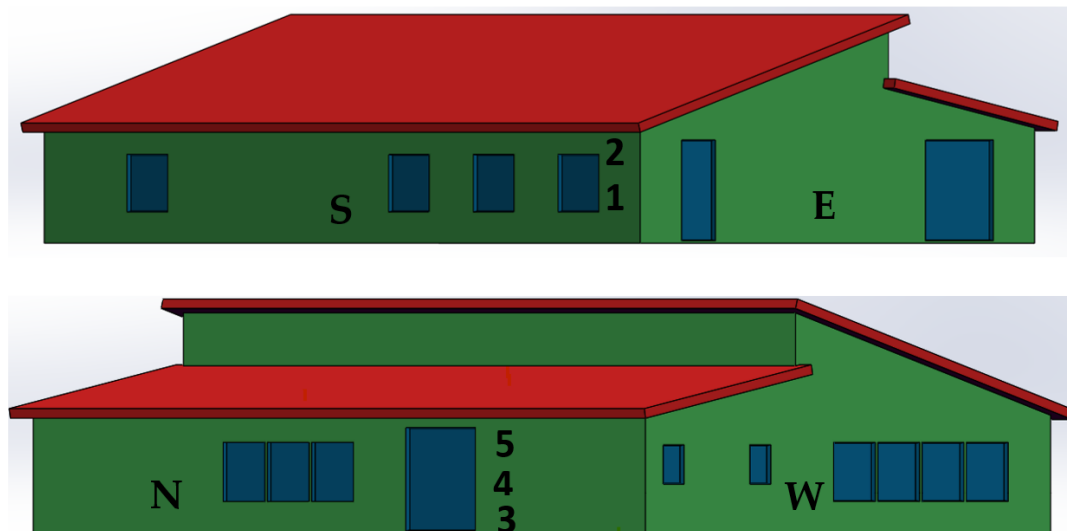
Location of the five sensing boxes on the building. The building is coloured according to materials with green indicating PVDF cladding, red indicating integrated PV roofing, blue indicating windows and doors, and dark purple indicating the soffit region composed of PVC cladding material.
